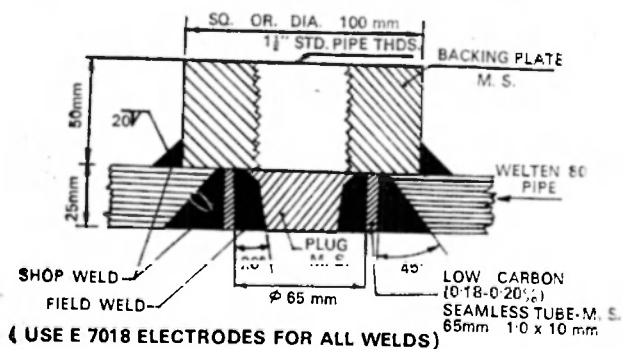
DETAIL OF GROUT HOLE A PLUG
